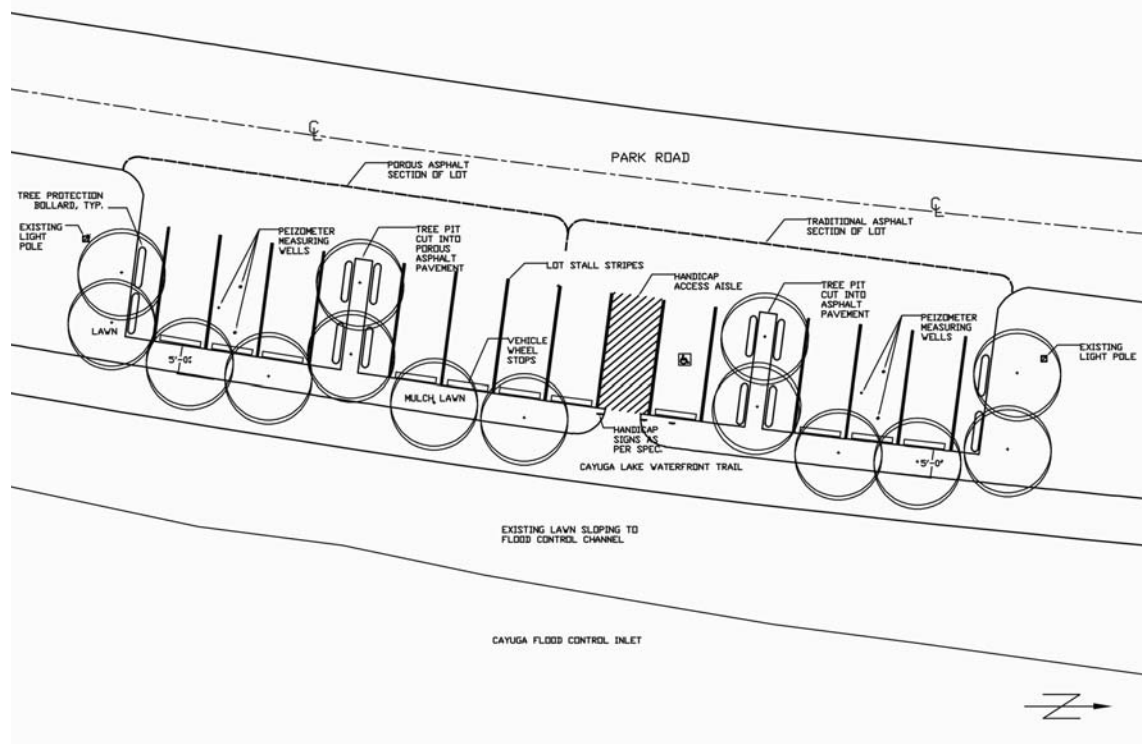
As Built drawing of Parking Lot. The left side of lot is constructed of porous asphalt on a structural soil base, while the right side of the lot is constructed of traditional asphalt and structural soil base.
